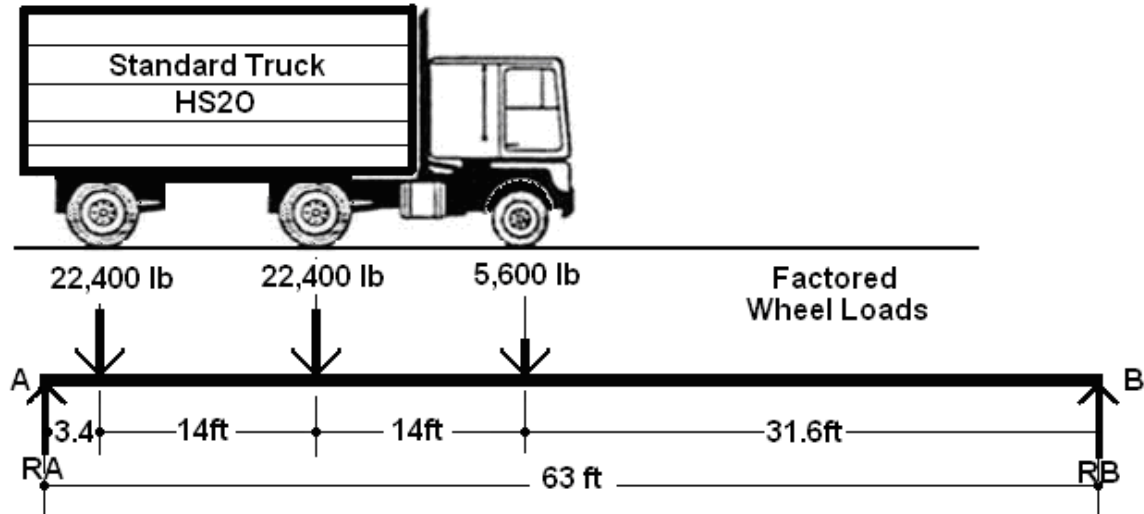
Position and Loading of HS20 Truck to introduce Maximum Shear at 3.4ft from support of an Interior Girder.
